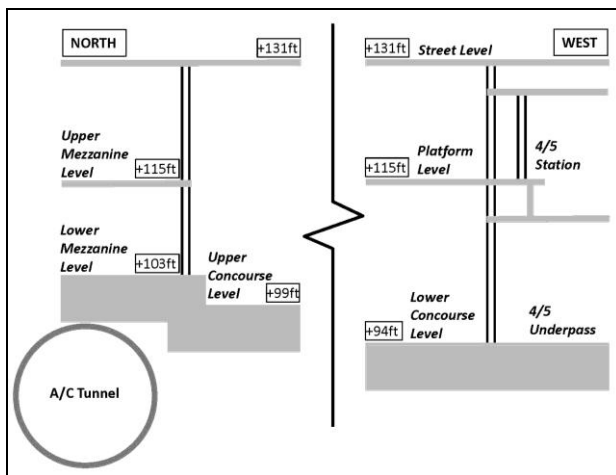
Schematic cross section through the north and west sides of the Transit Center, showing the elevations of the various levels.
